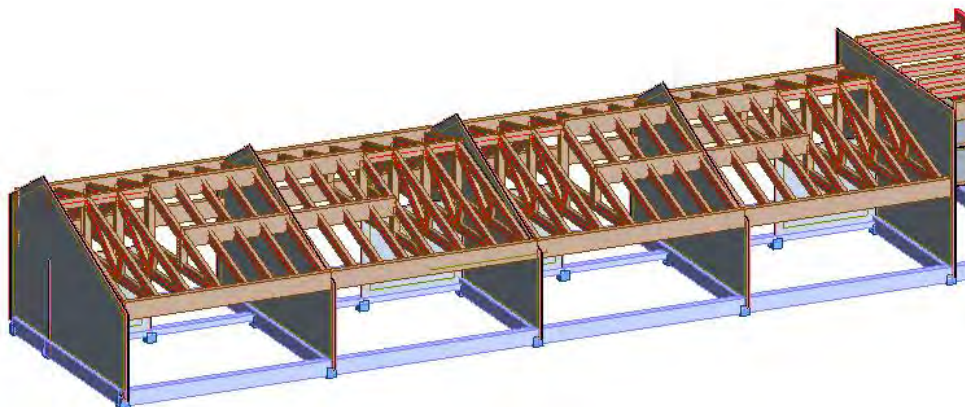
Roof Structural Elements in the “Wings” Portions of the Building
